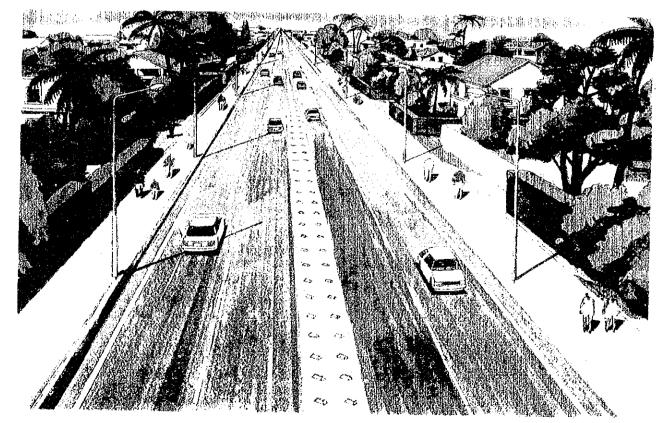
Typical Cross Sections of Proposed Roads
